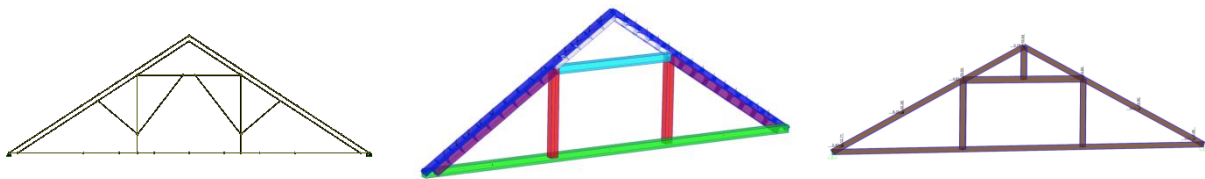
2D elastic linear Finite element models – São Roque Church (left), Santarém Cathedral (center) and Runa Asylum (right).
